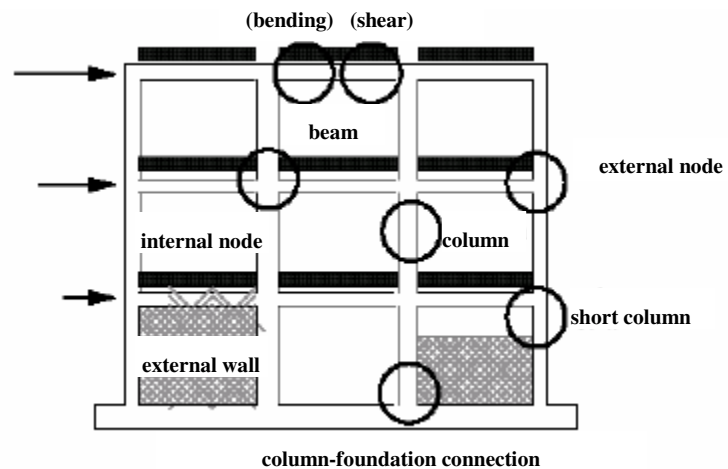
Examples of typical problems occurring in RC buildings designed for gravity loads only (Verderame, 1999)
